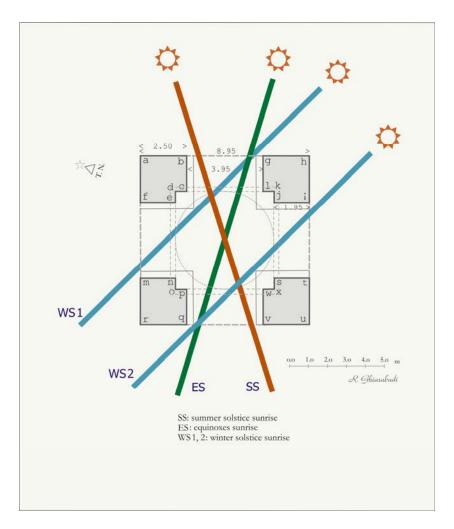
The floor plan and sightlines of Nevis Tetrapylon
